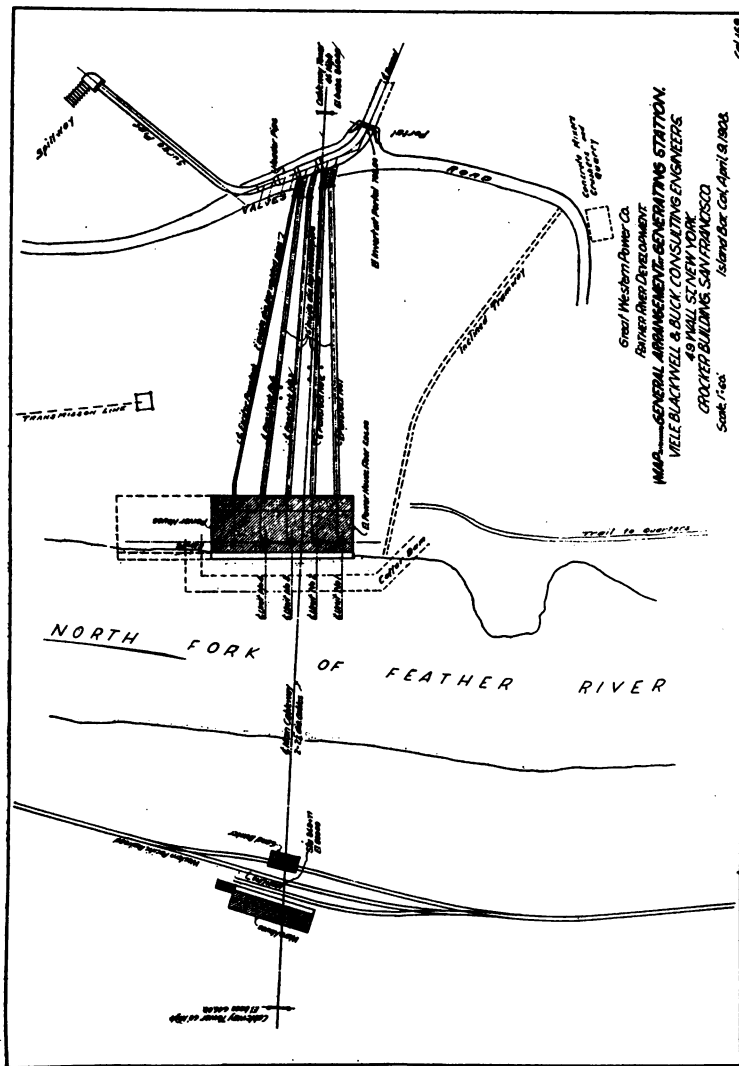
GENERAL LAYOUT OF POWER HOUSE AND PENSTOCKS.
